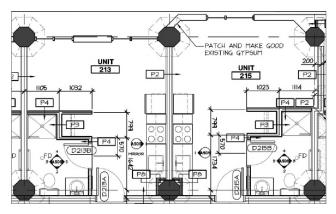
; Floor Plan Units 213 and 215 Showing Test Wall
